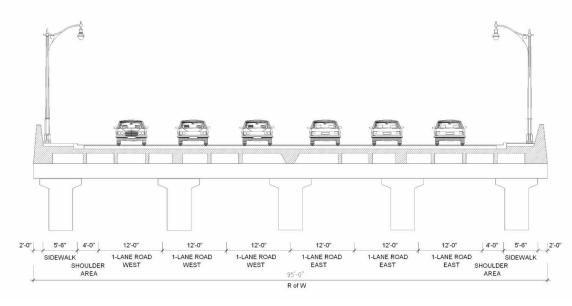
Existing Cross-section - SR 934/71st Street at East Bay Drive
